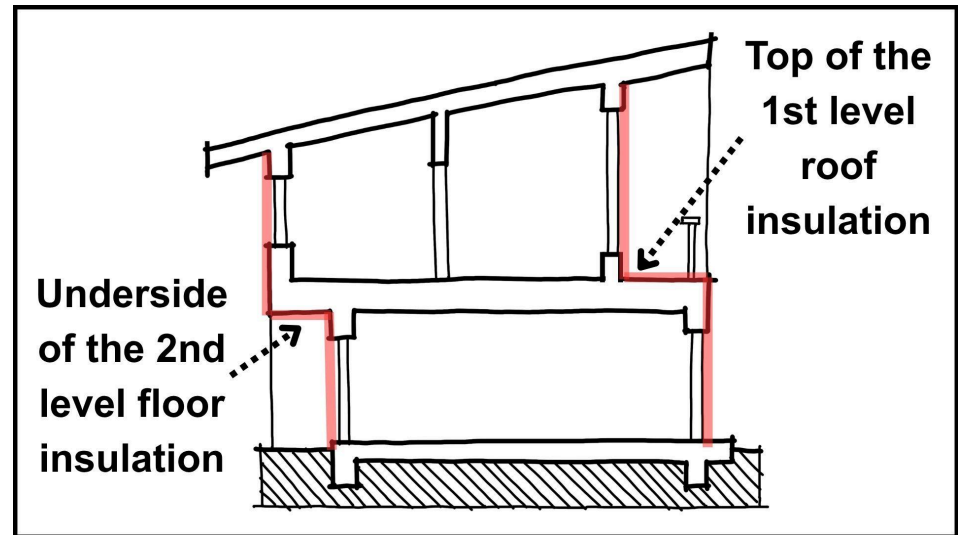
Section diagram showing where you would extrude a floor plan to the underside of floor insulation and to the topside of roof insulation.
